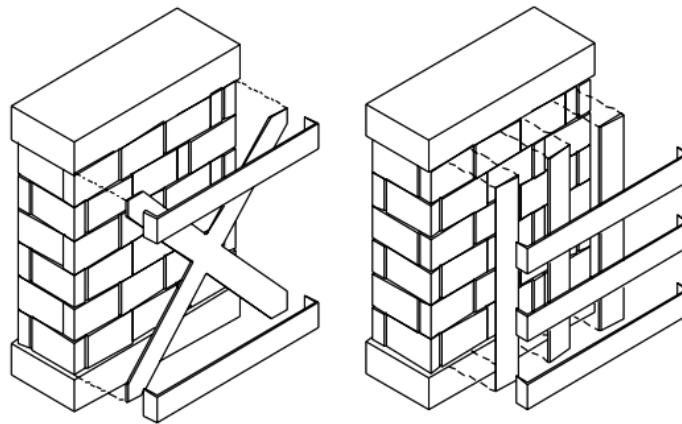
U-wrap system for cross layout (left) and grid layout (right) (Marcari et al. 2007).
